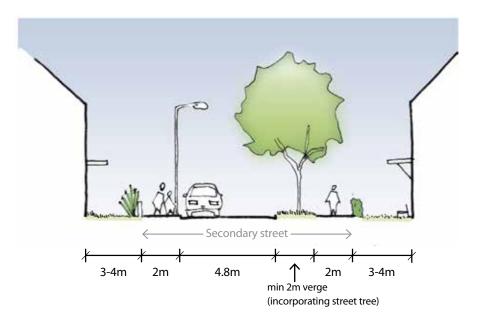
C-C – indicative, typical secondary street cross section (refer to Fig. 17 for section location)
